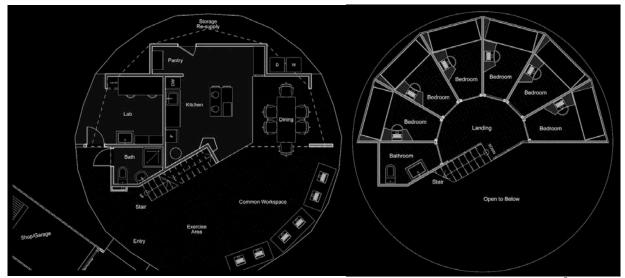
Layout of HI-SEAS. First floor (bottom); second floor (top). (Source: HI-SEAS⁵)
